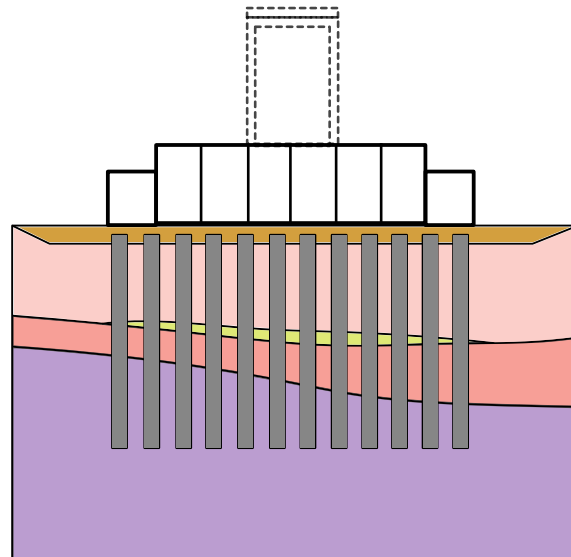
Ground improvement by inclusions for tower foundations (Kroon *et al.*, 2021)
